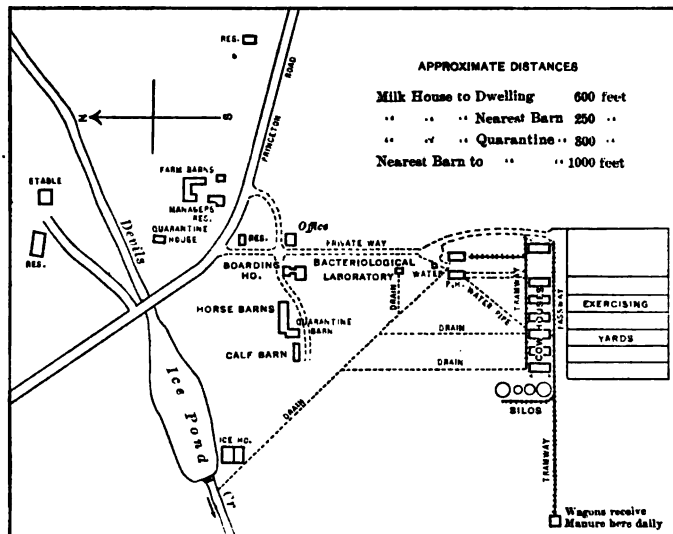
DIMENSION PLAN SHOWING POWER HOUSE AND ARRANGEMENT OF BUILDINGS ON DAIRY FARM AT PLAINSBORO, N. J.
